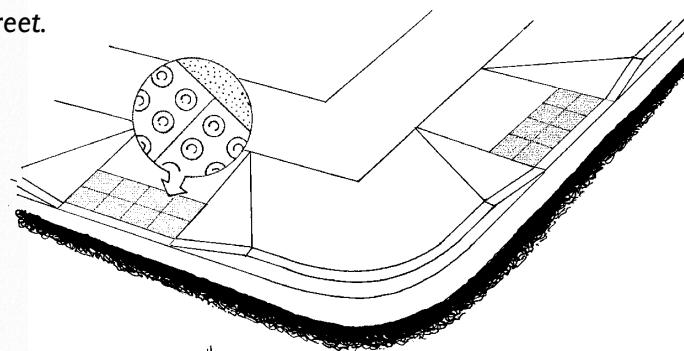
GOOD DESIGN: A 610 mm (24 in) strip of detectable warnings should be installed at the bottom of a curb ramp to indicate the transition from the sidewalk to the street.
